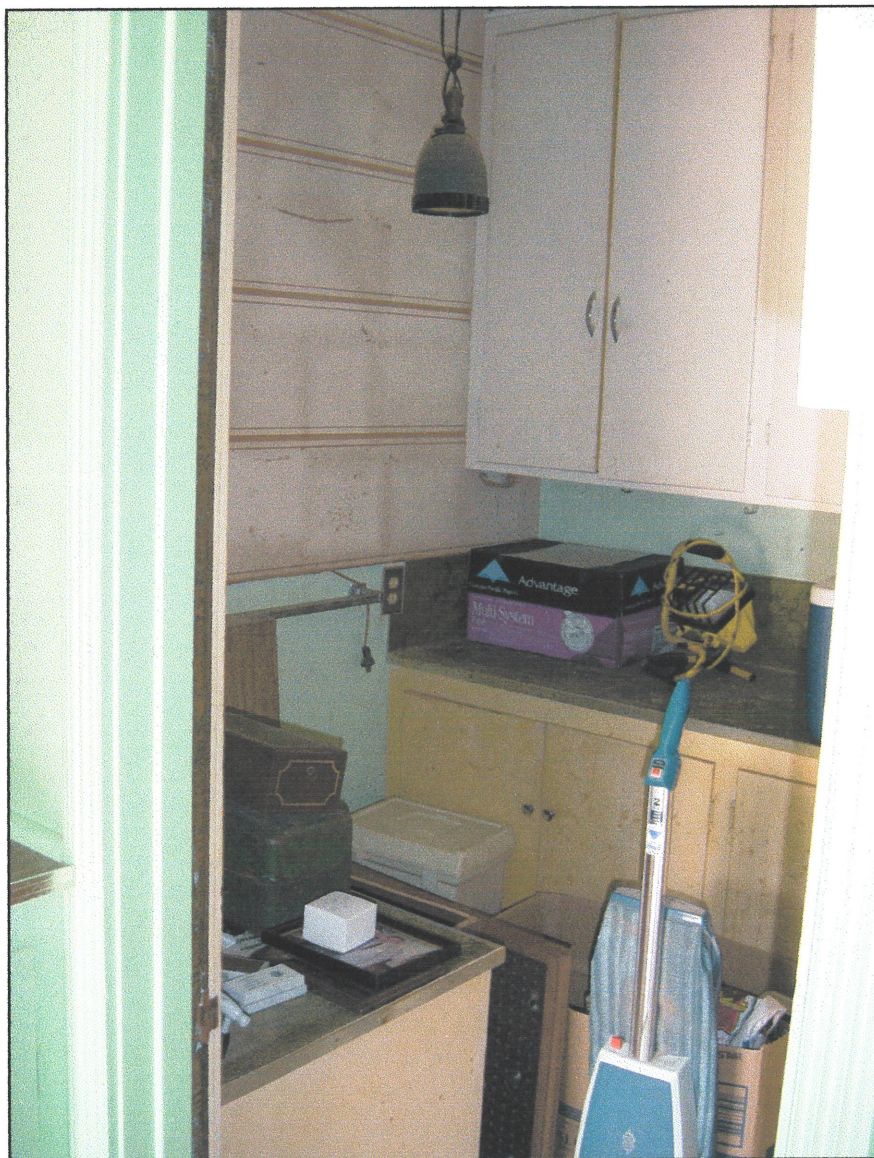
Darkroom looking west. Note stained birch cabinets and metal trim on counter top. The door has weather-stripping to seal off the light when the door is closed. A darkroom fixture hangs from the ceiling.
